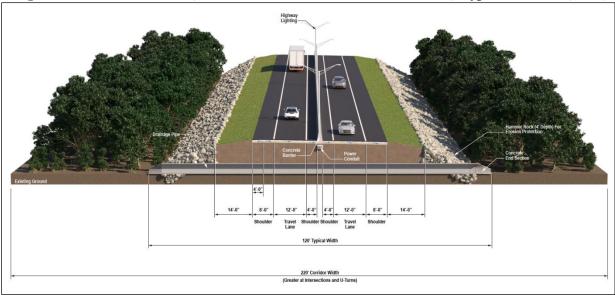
shows what the Will T Connector will look like in the 2026 construction phase.
